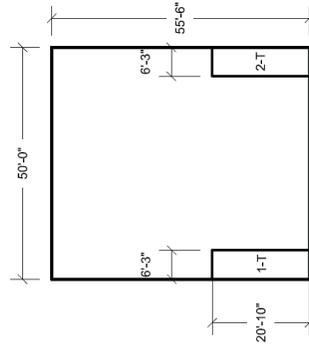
H.6-118. COOLING TOWER EAST WALL LOOKING WEST
